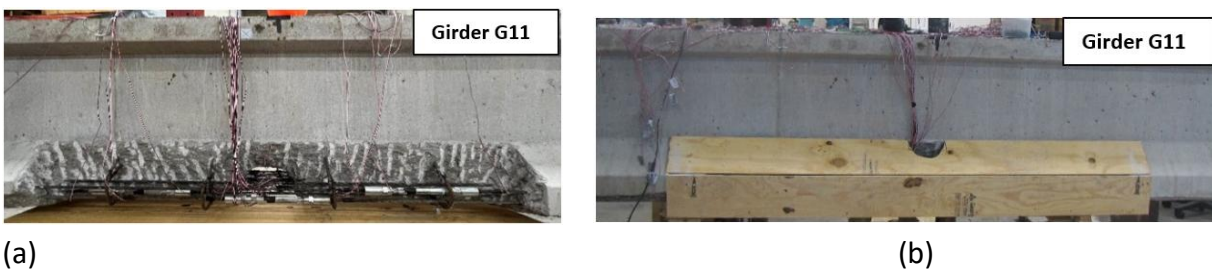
Girder G11 with 25% strand damage (a) Strand splicing configuration, (b) Formwork used for splicing repair
